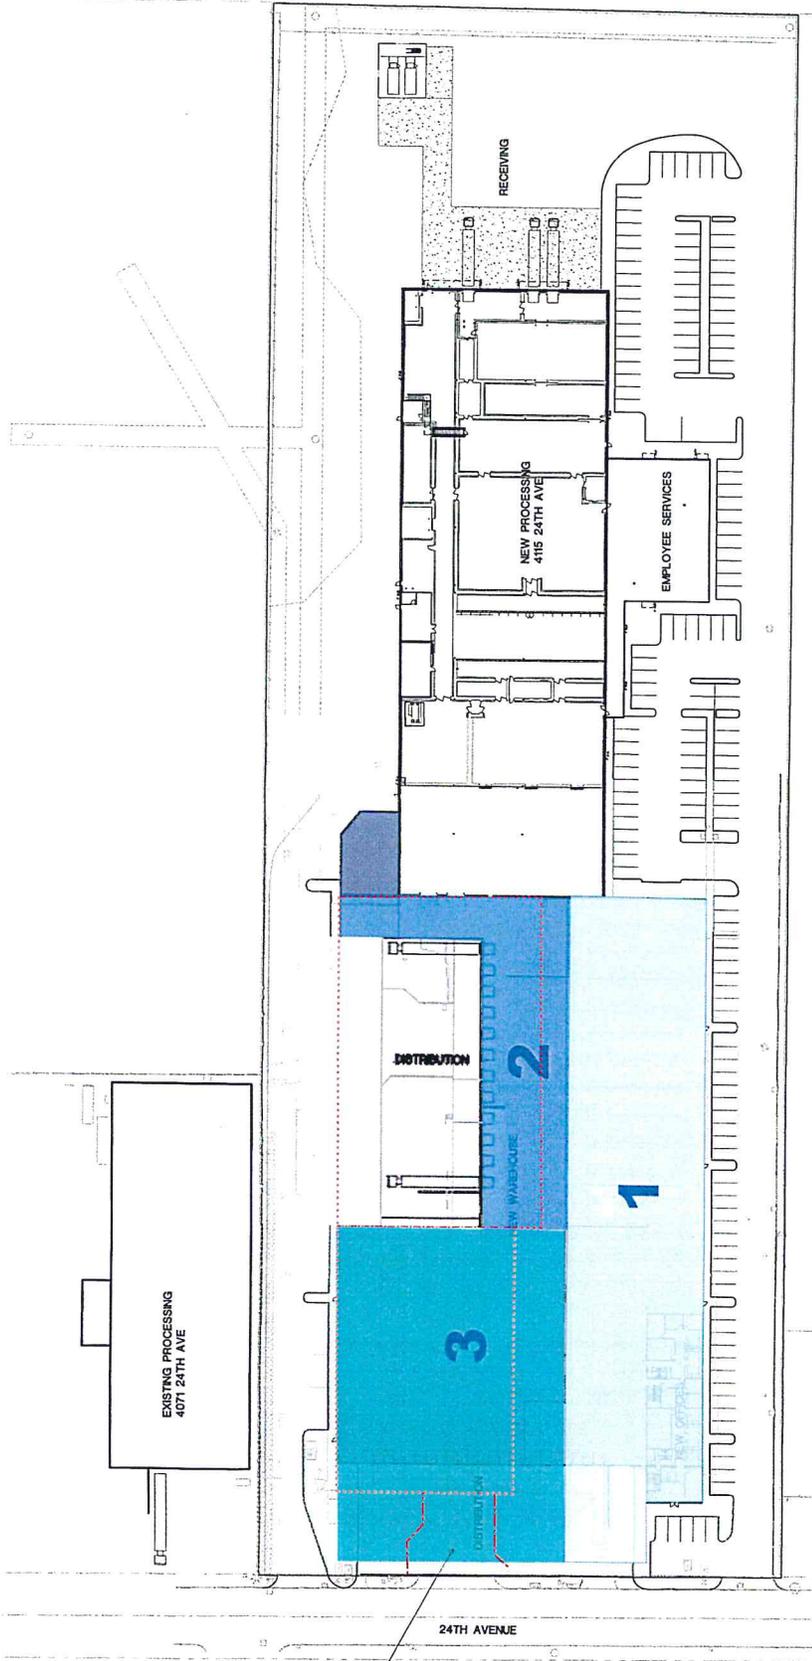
EXHIBIT 'B' -- DRIVEWAY PLANS
